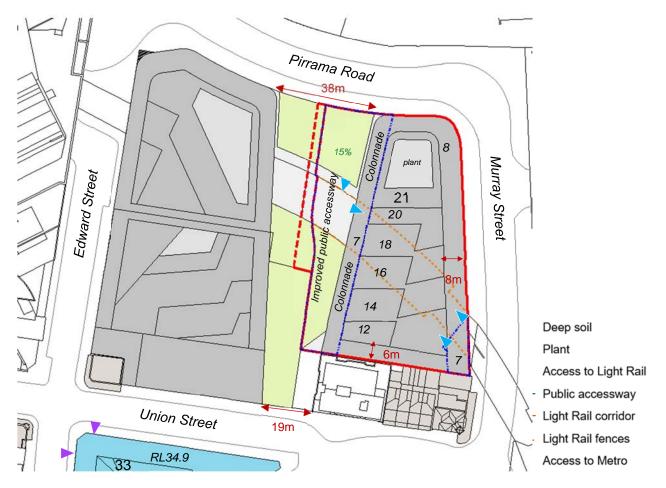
site plan showing proposed controls for mixed use at 1-27 Murray Street
